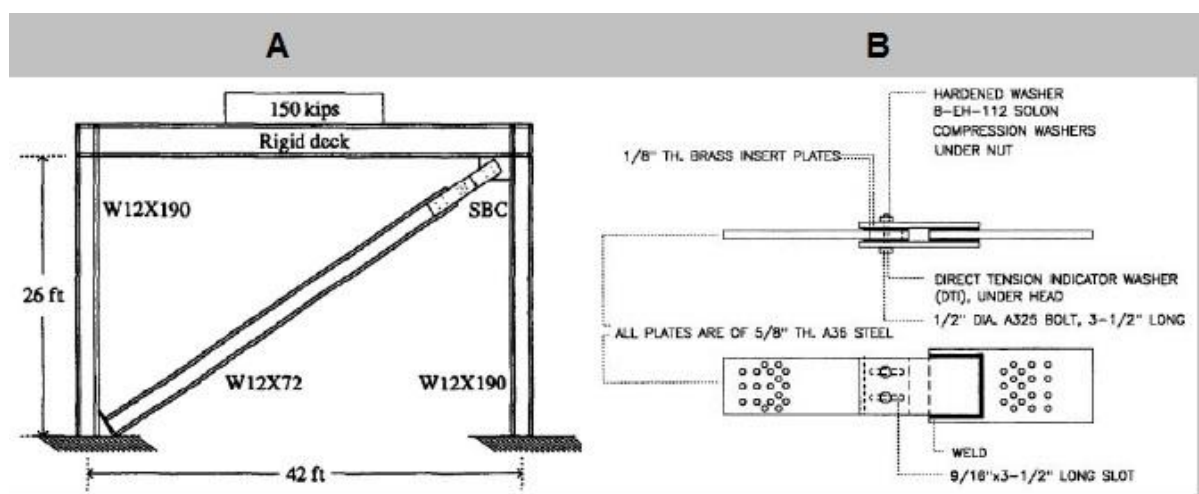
Slotted bolted connections: (A) Application in a diagonal bracing system, (B) Front view and cross-section of the damper (Haghollahi, 2014)
